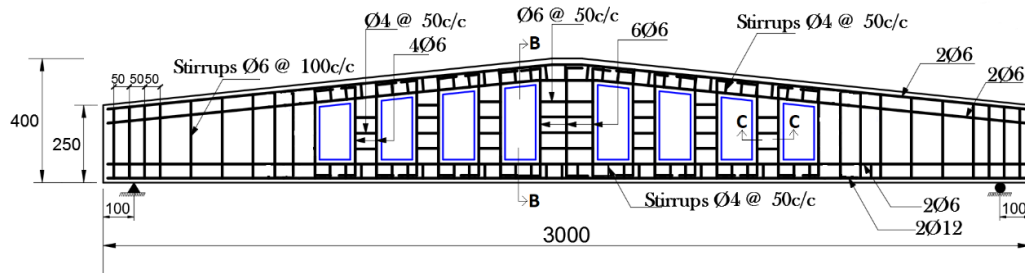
Details of steel reinforcement of perforated rafter (all dimensions are in mm)
